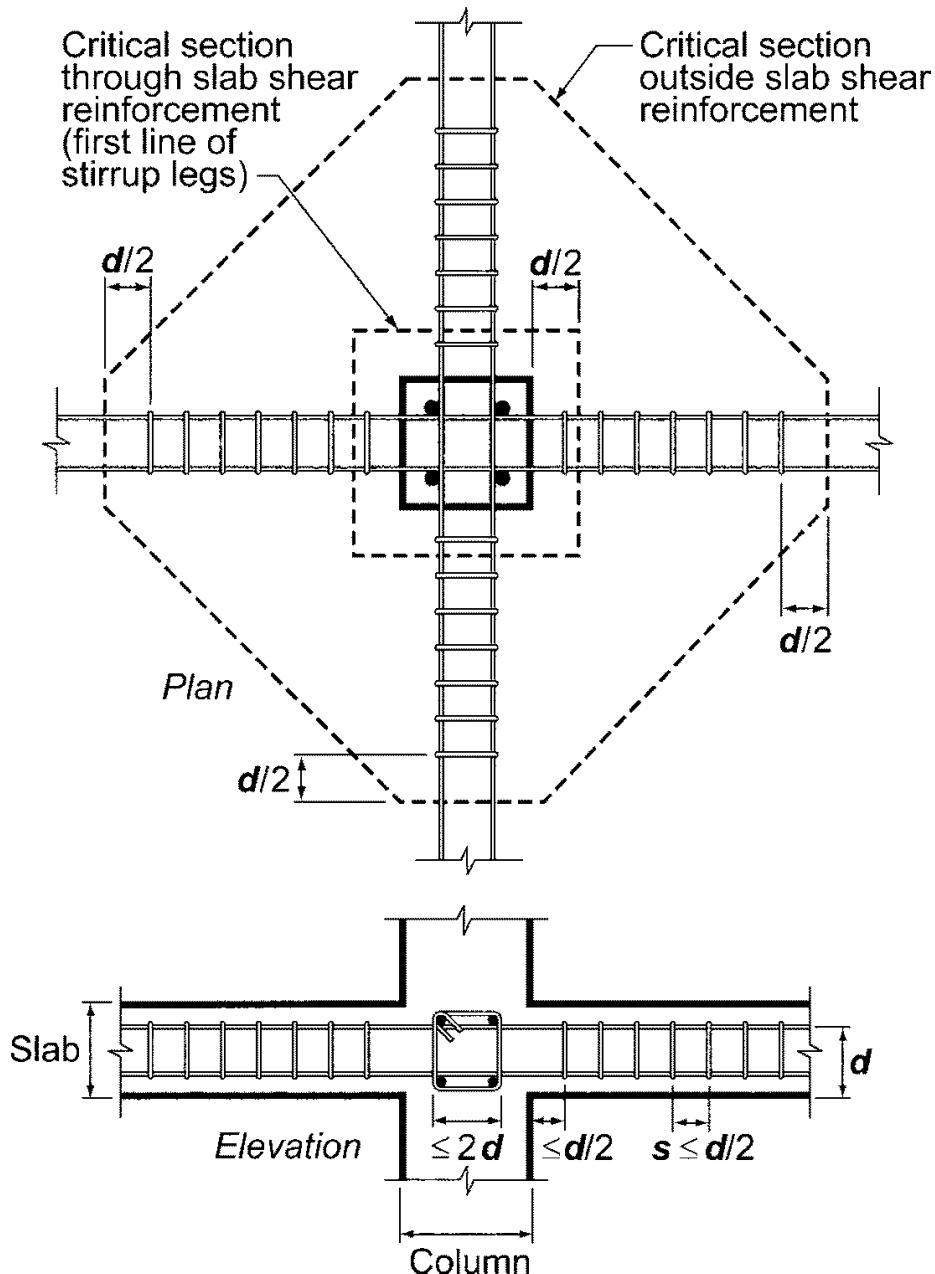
Arrangement of stirrup shear reinforcement, interior column.
